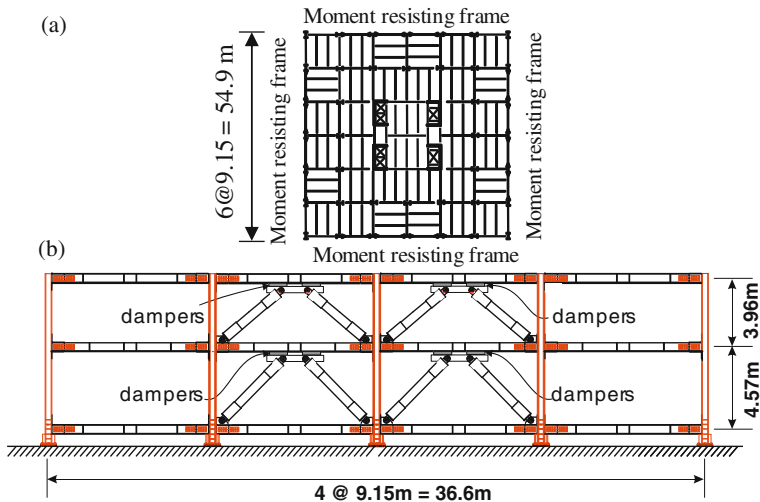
Prototype building structure: (a) plan view, and (b) perimeter MRF with dampers and diagonal bracing
